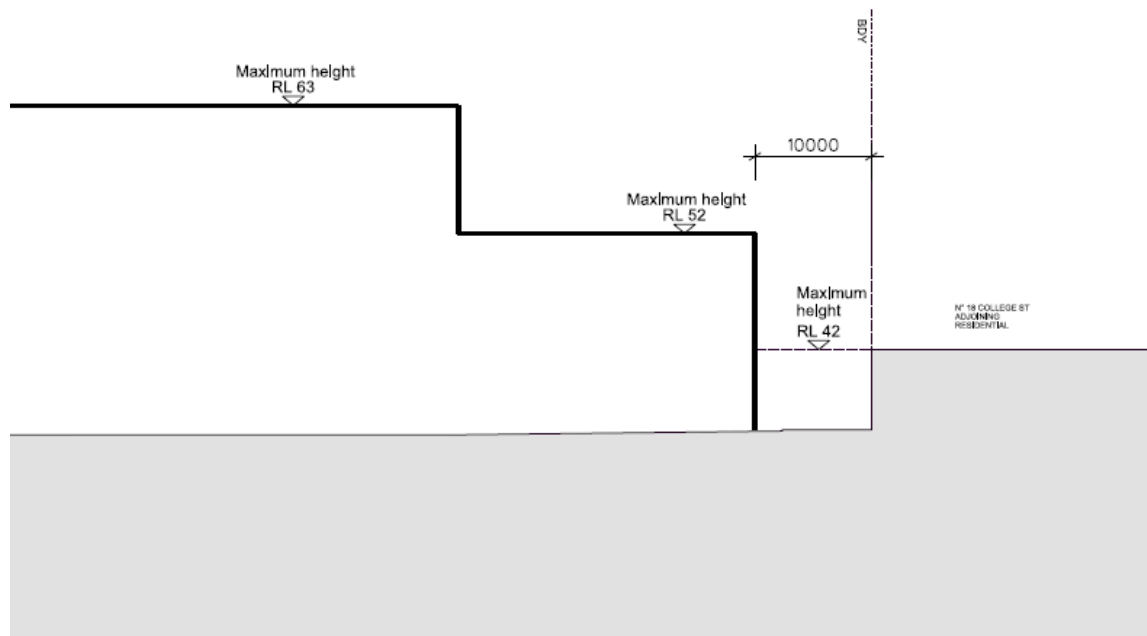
Section D Setbacks to neighbouring residential property at 18 College Street
